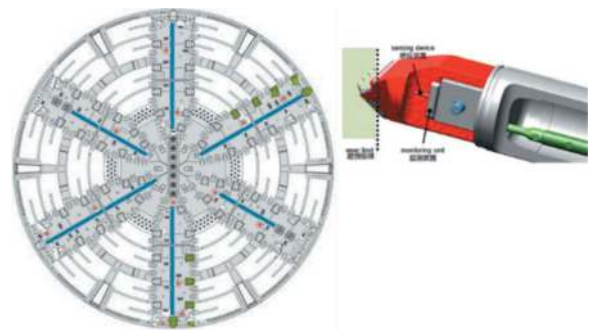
Wear monitoring of cutting wheel and cutting tools.
